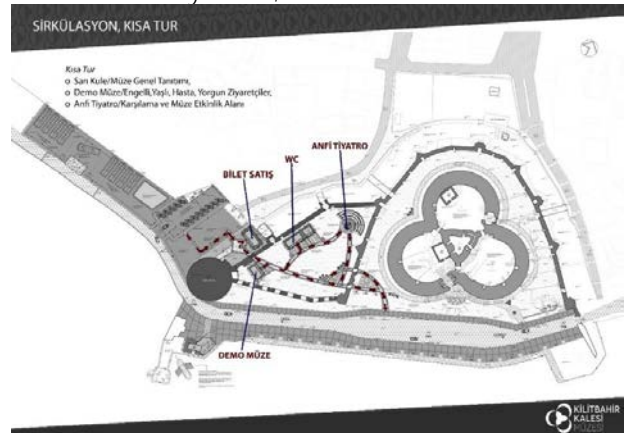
Kilitbahir Castle Site Plan-Short Tour Route, K. Duyar.
